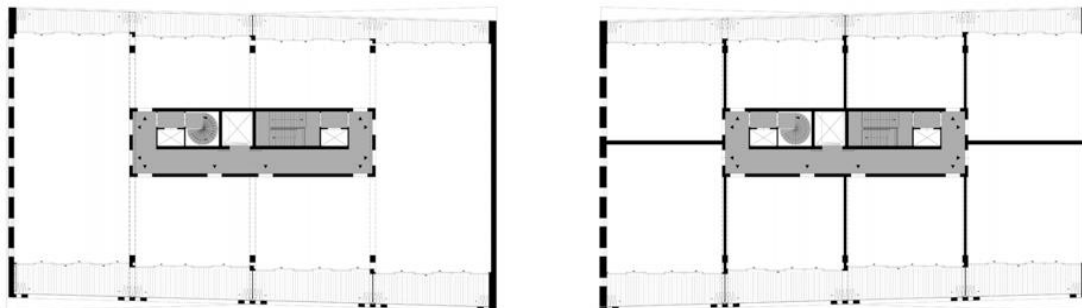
level 6 without division walls and level 7 with the maximum number of division walls (final design)
